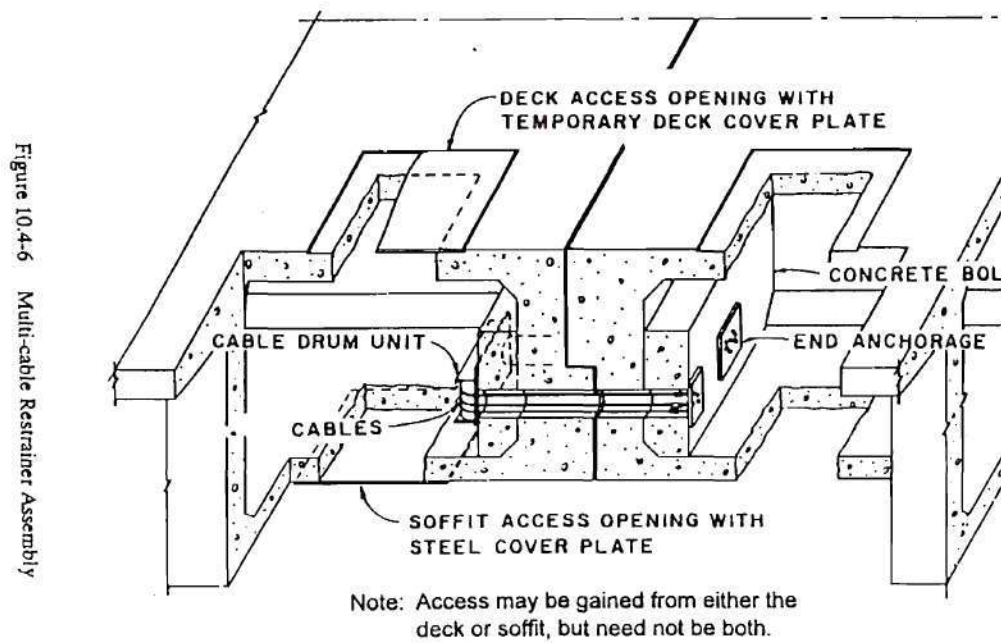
Typical Steel Restrainer Cable Connection on a Multi-Frame Bridge
